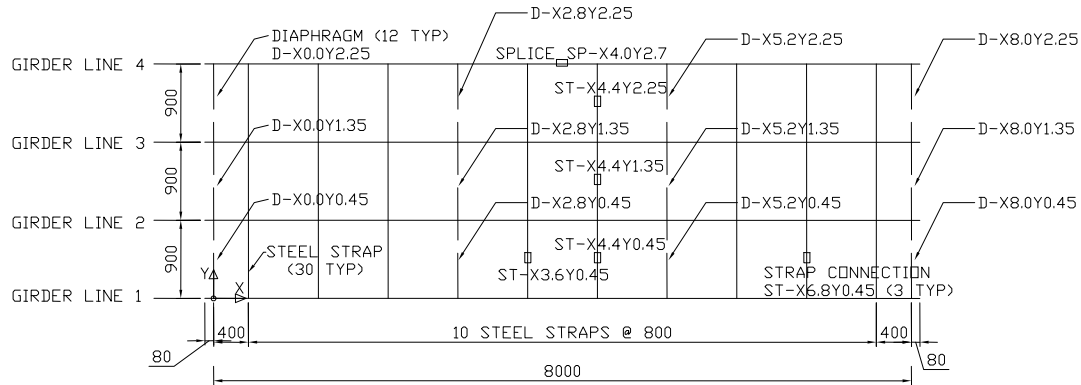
Plan view of the structural steel superstructure of the model showing splice, steel strap, and diaphragm locations (dimension in mm).
